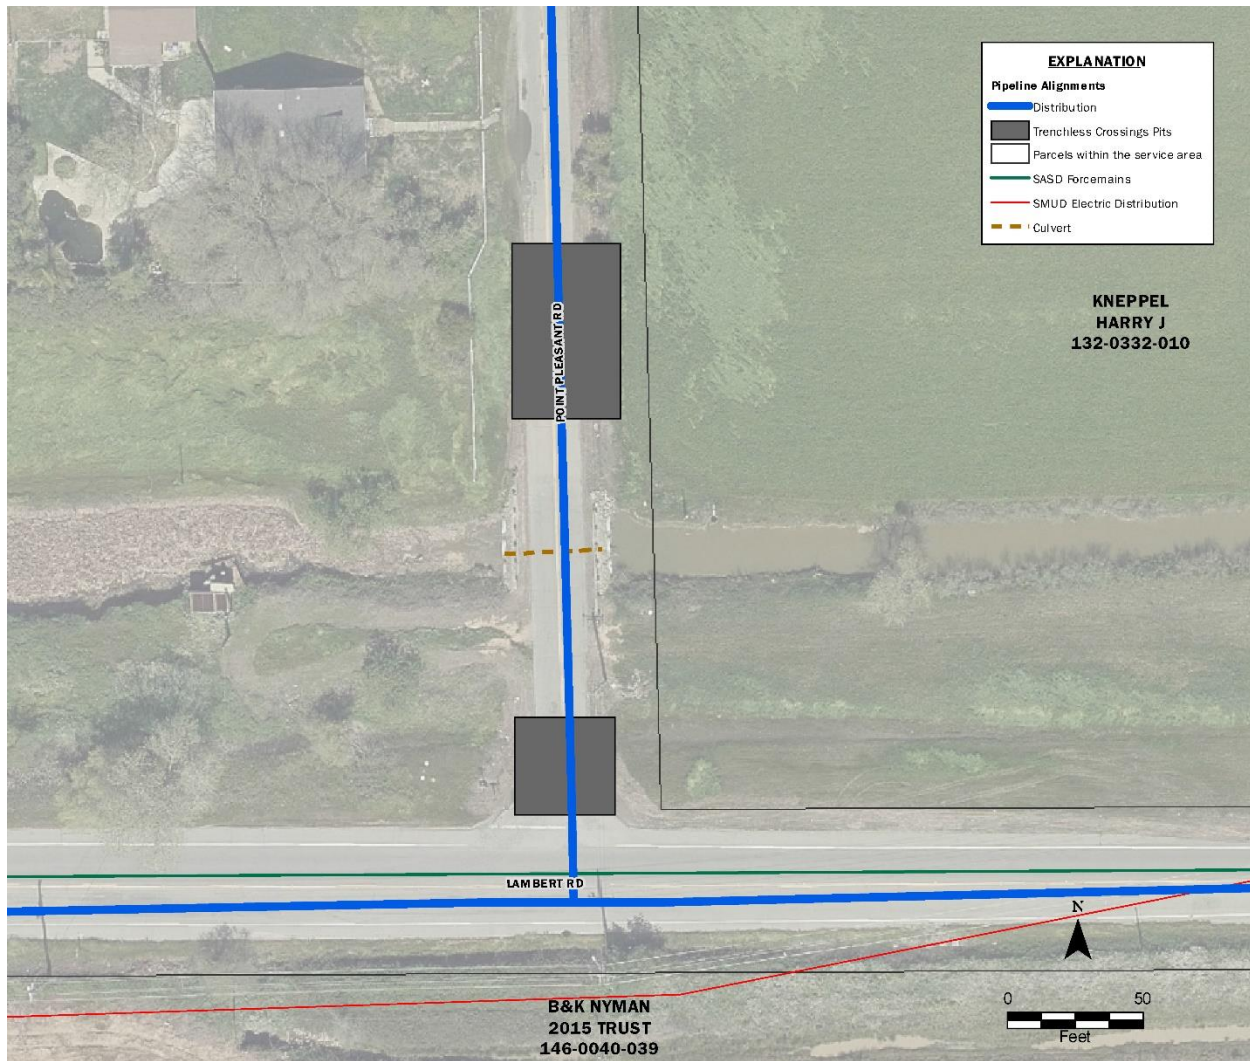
Proposed Trenchless Crossing of Lambert Canal at Point Pleasant Road
